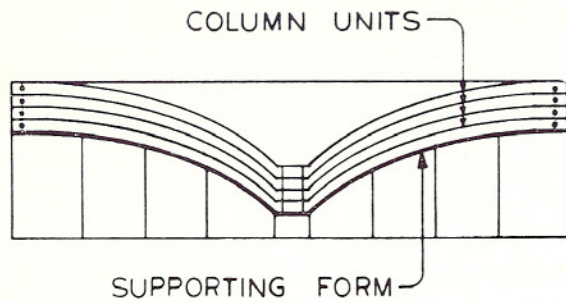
Precasting of units. Constant vertical thickness permits elements to be nested on jobsite casting beds
